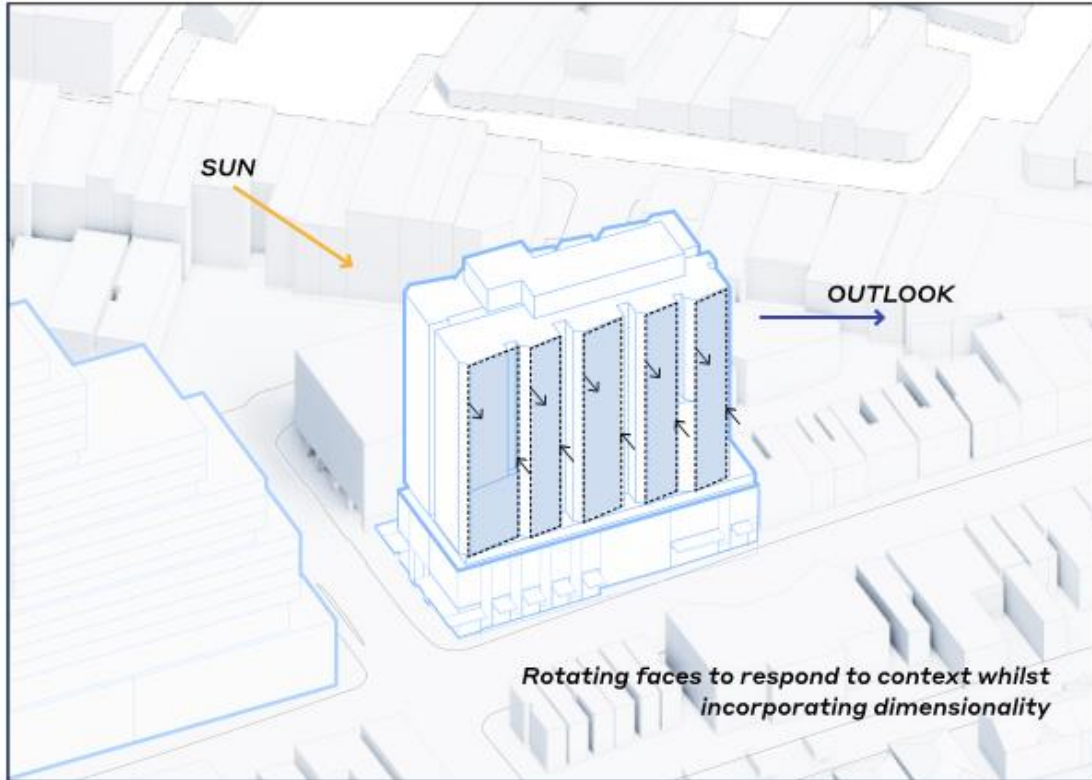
Rotating Faces (Source: Woods Bagot, 2024)
